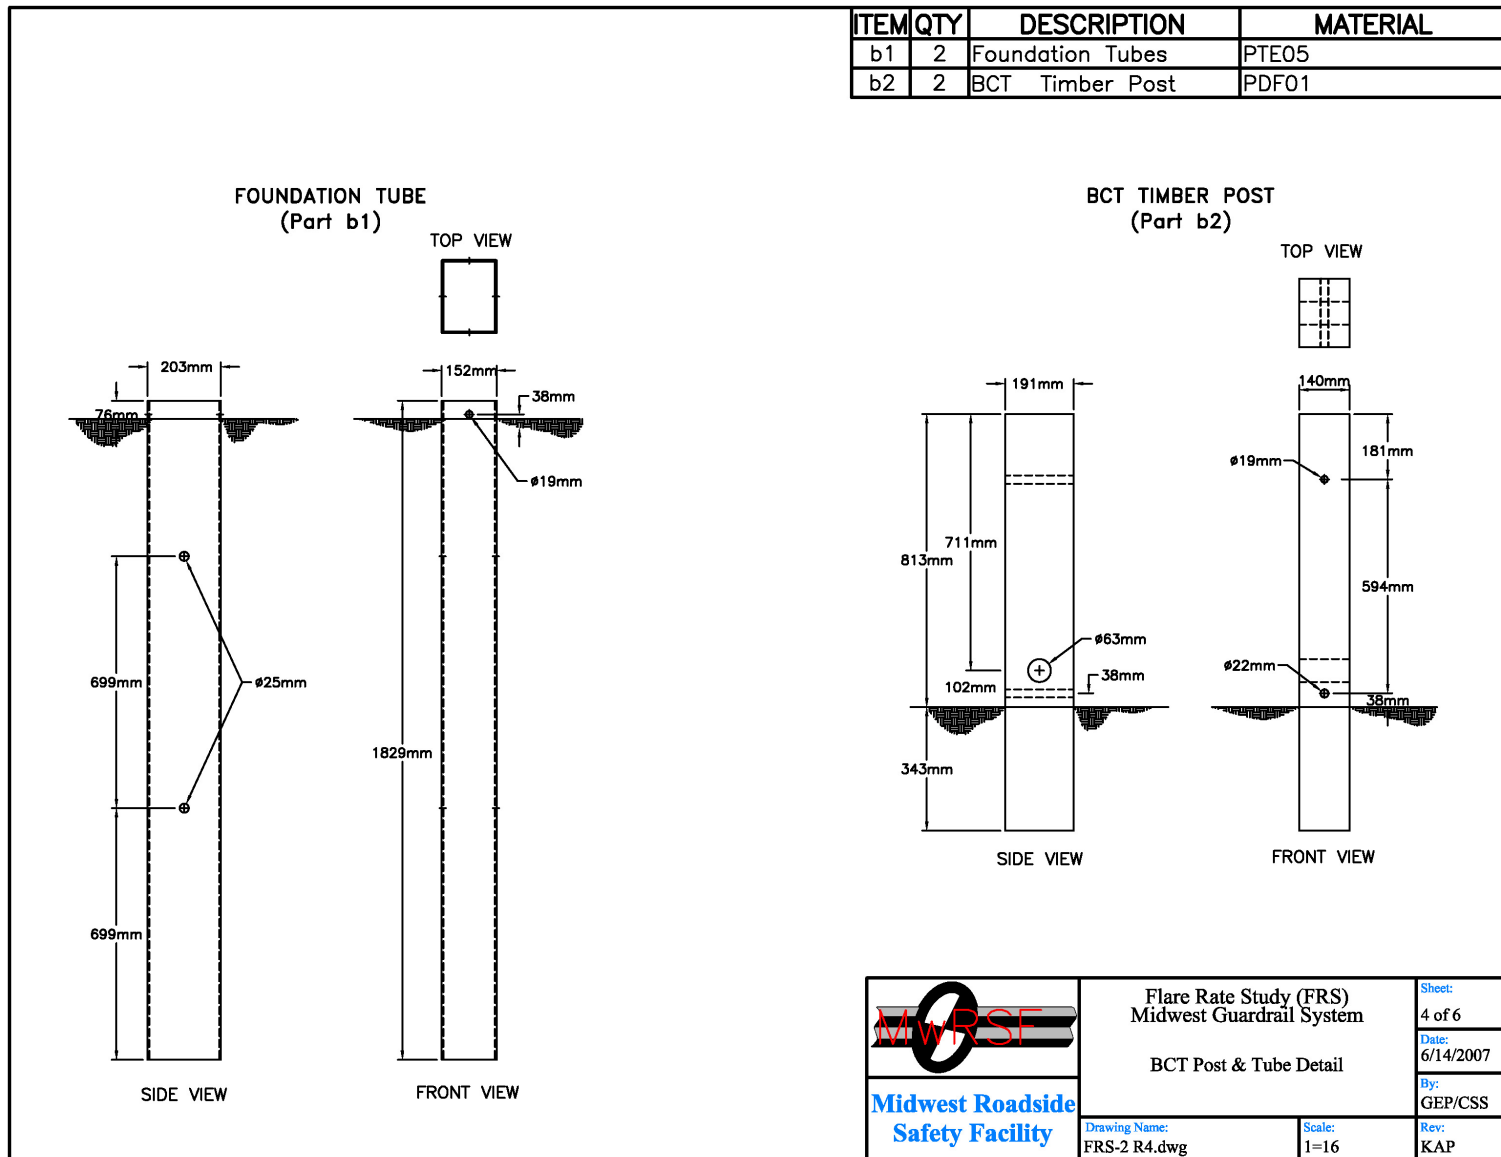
Anchorage Details, Design No. 2 (Metric)
